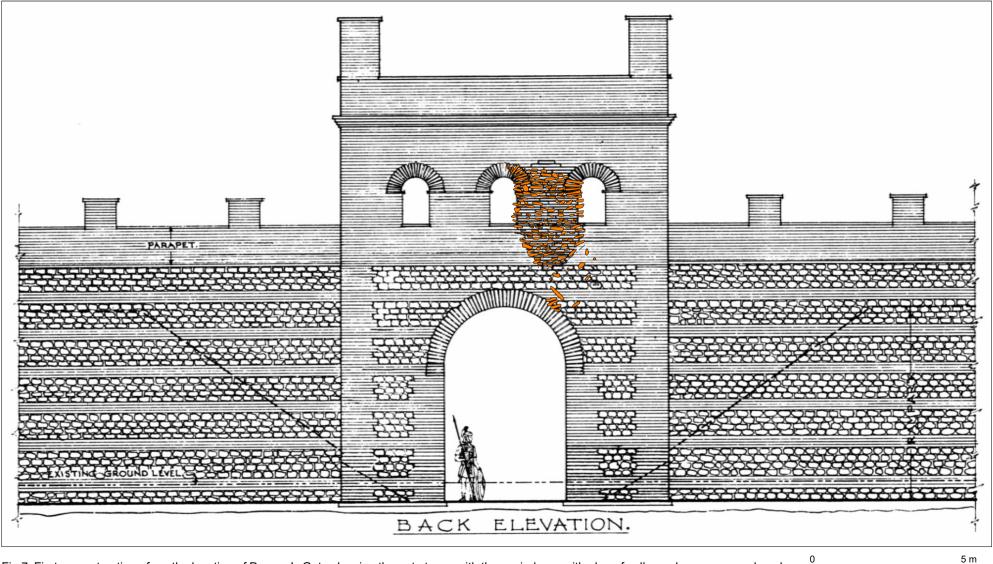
First reconstruction of south elevation of Duncan's Gate showing the gate tower with three windows, with plan of collapsed masonry overlayed. Reproduced from Hull 1958, 38.
